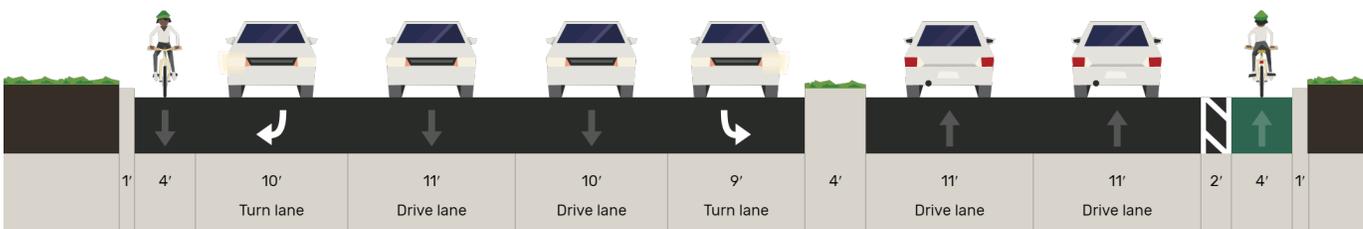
San Pablo Avenue (North) – Alternative 1.2 Approach to 23rd Street Intersection (Facing North)
